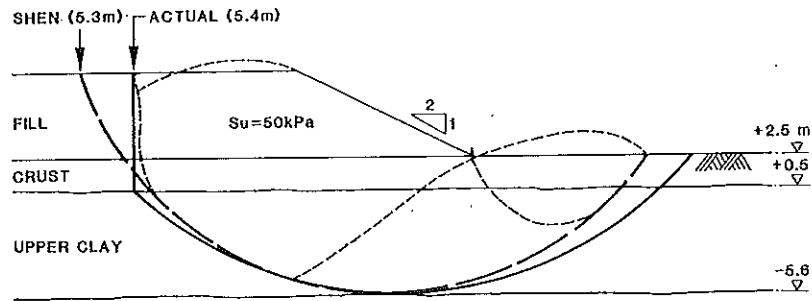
Embankment failure thickness and failure mechanism predicted by J.M. Shen (see Table 1)
